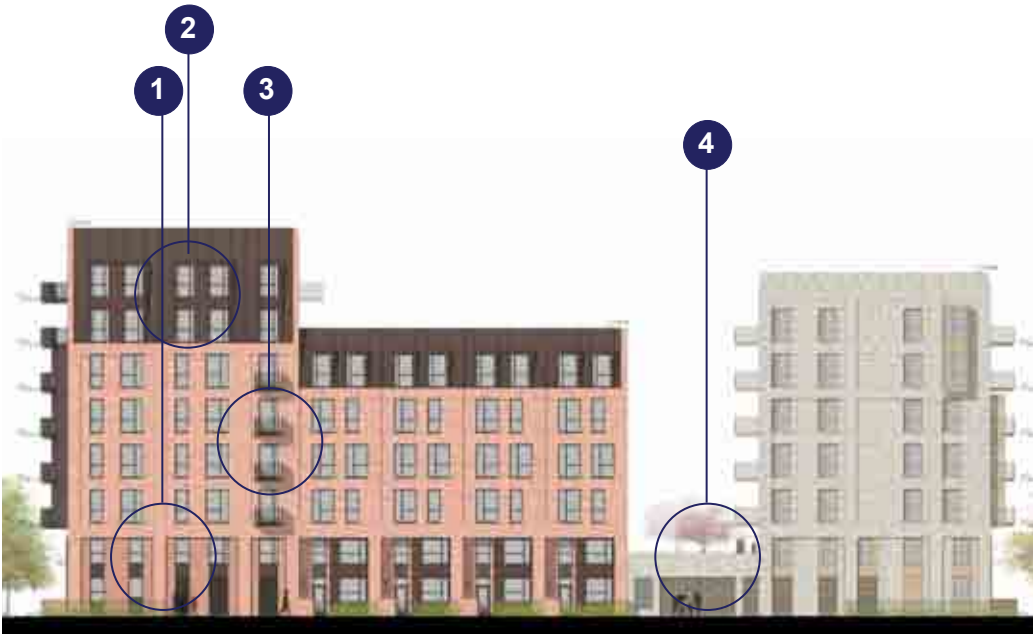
Block 5 North Elevation Revised Planning Submission February 2015
